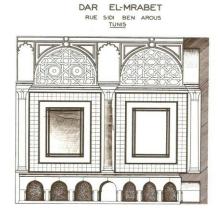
Plan of House Ek Mrabet – Source Jacques Revault
